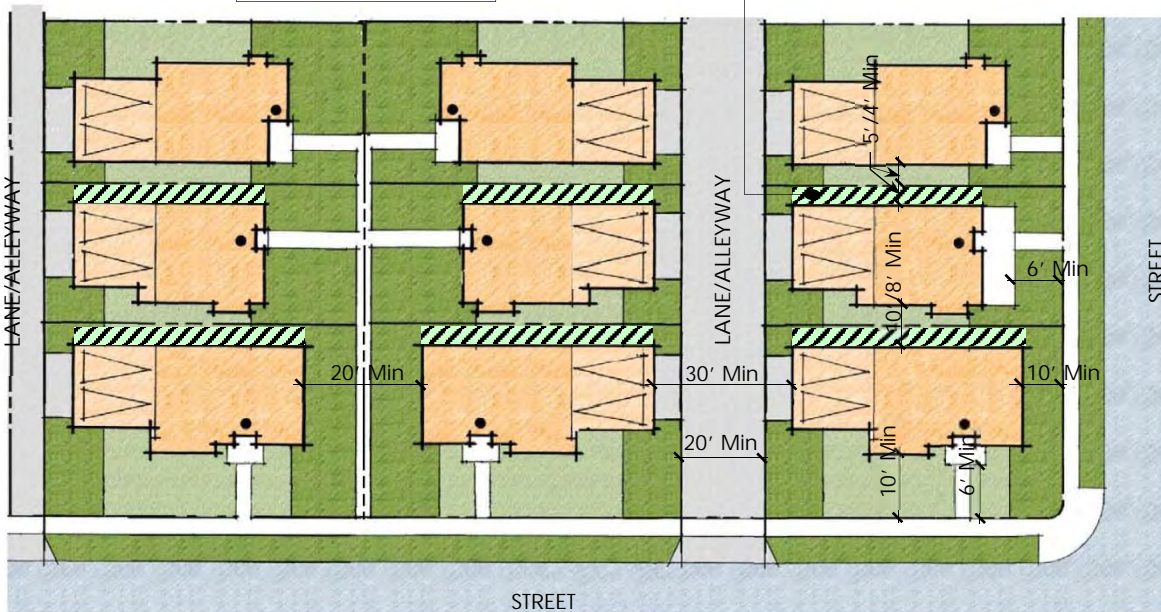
B: Example Development—Small Lot Alley-Loaded Single-Family Residential Example
